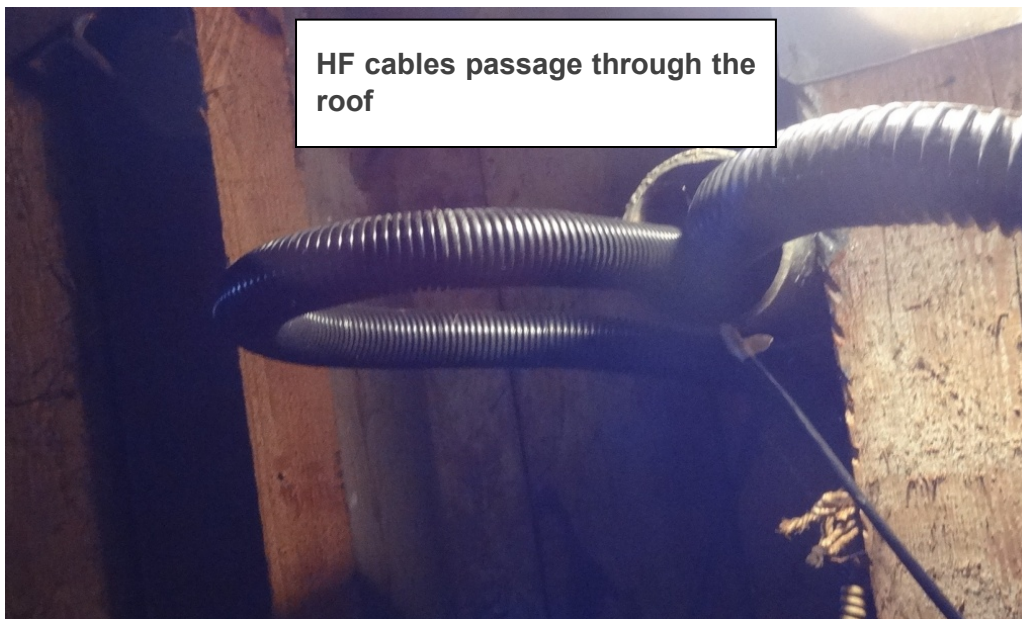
View of the entry of antenna cables through the roof with a vertical pipe - bottom view
